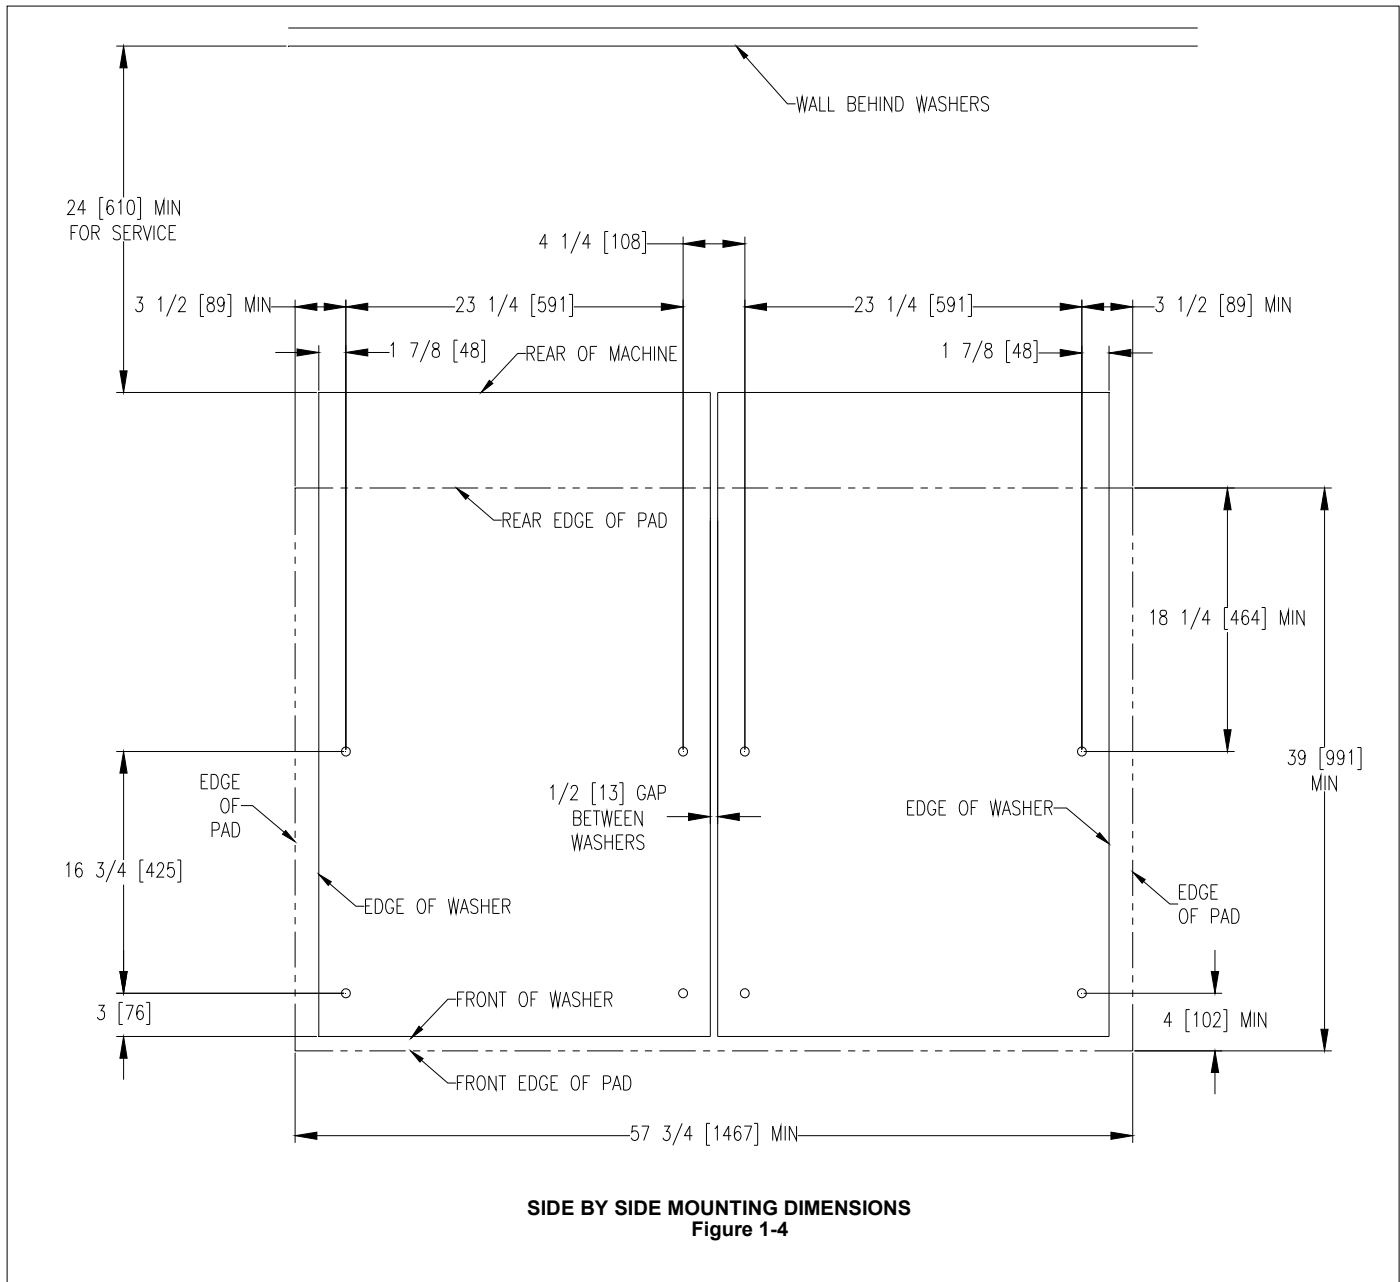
T-350 SWD Machine Side By Side Mounting Detail
